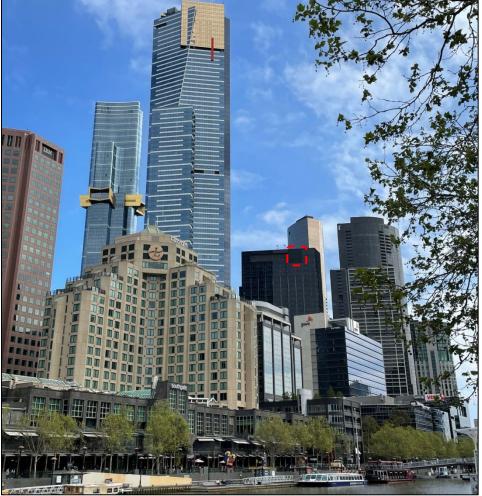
Site showing proposed area of works (in red) – eastern elevation
